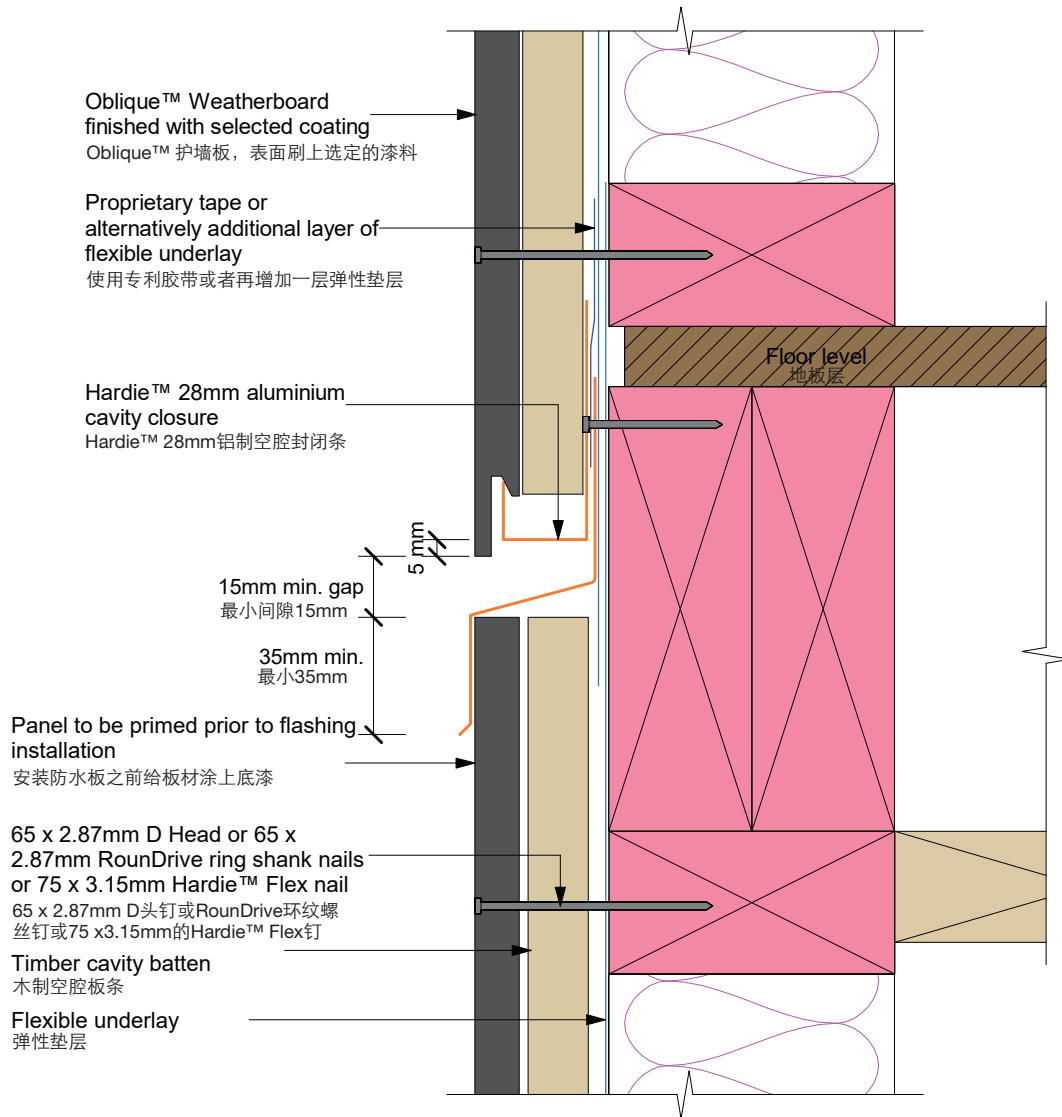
Drained flashing joint at floor level | 图32: 地板层排水防水接缝
